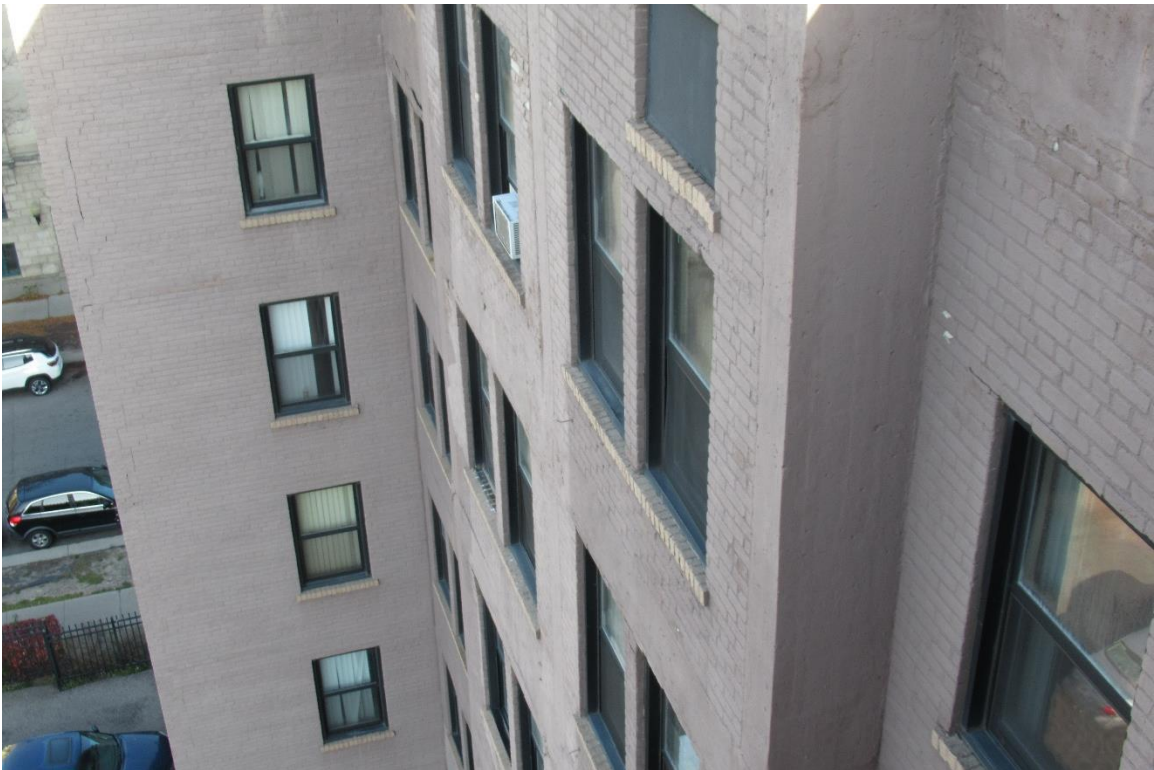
Exterior, Close up on painted brick, Looking Down. 11/6/20
